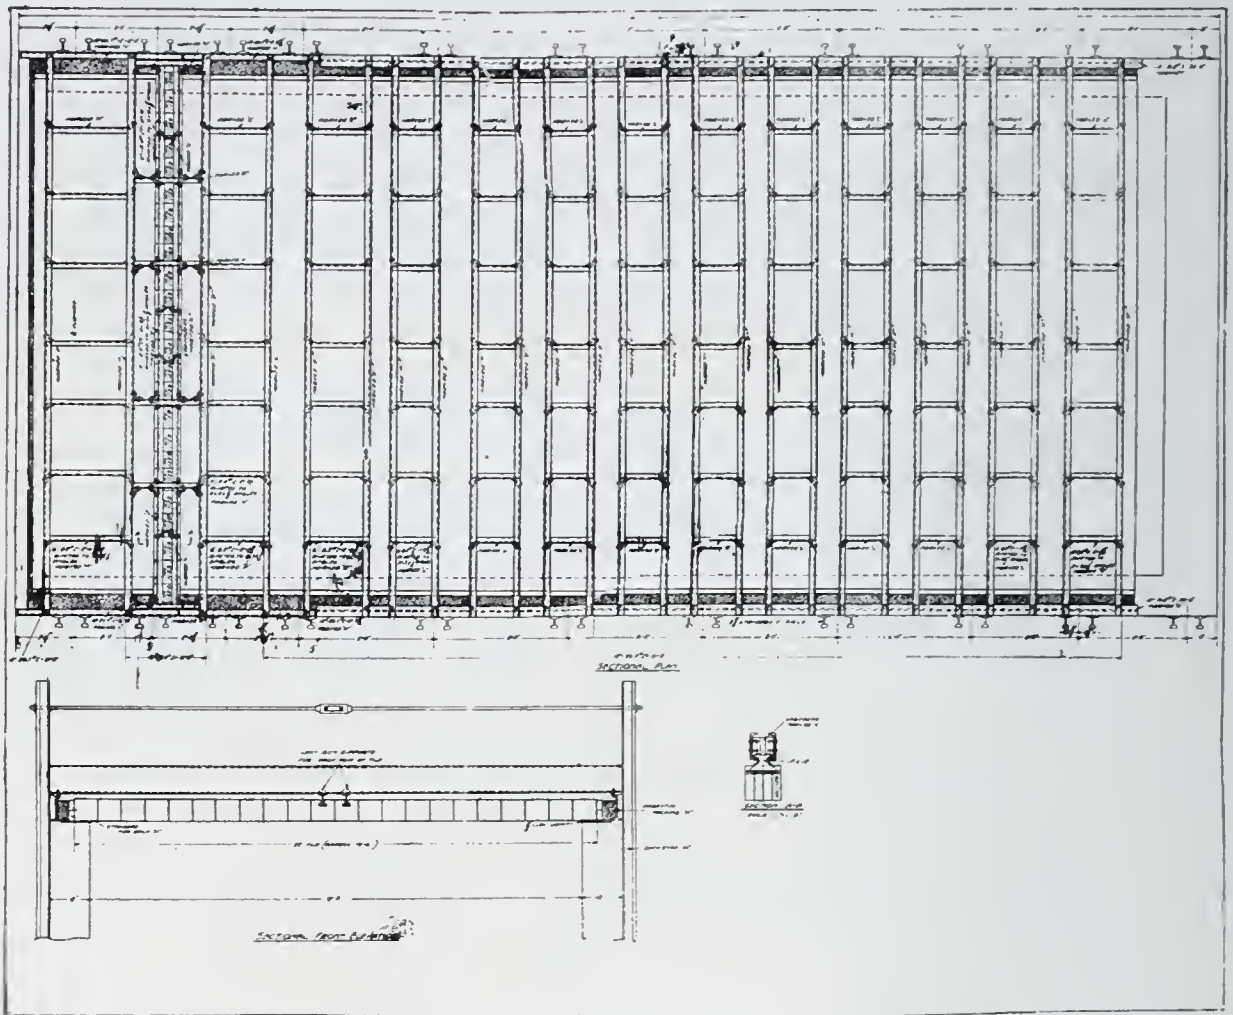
Plan and Front of Suspended Arch in Connection with Heating Furnaces, Showing Arrangement of Steel Suspension Members.
